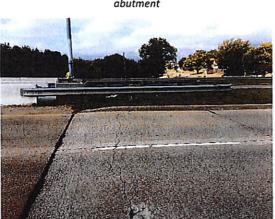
Damaged approach slab, northbound lanes, north abutment
